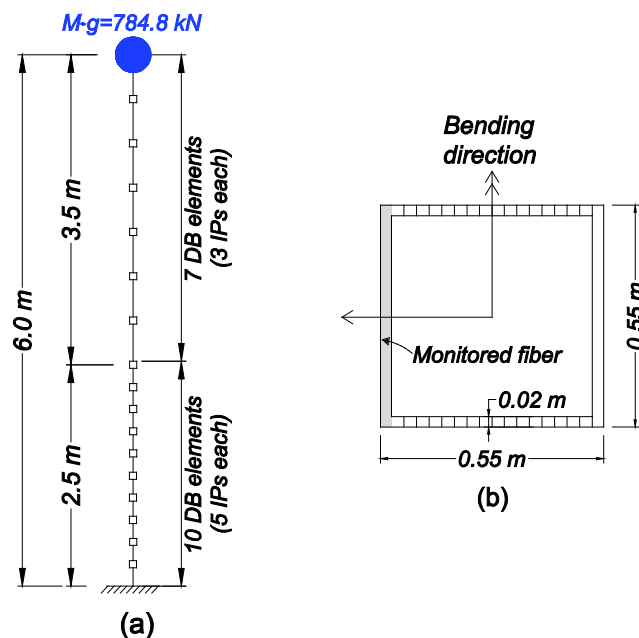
Steel cantilever bridge column: (a) general geometry and FE discretization, (b) cross section fiber discretization.
